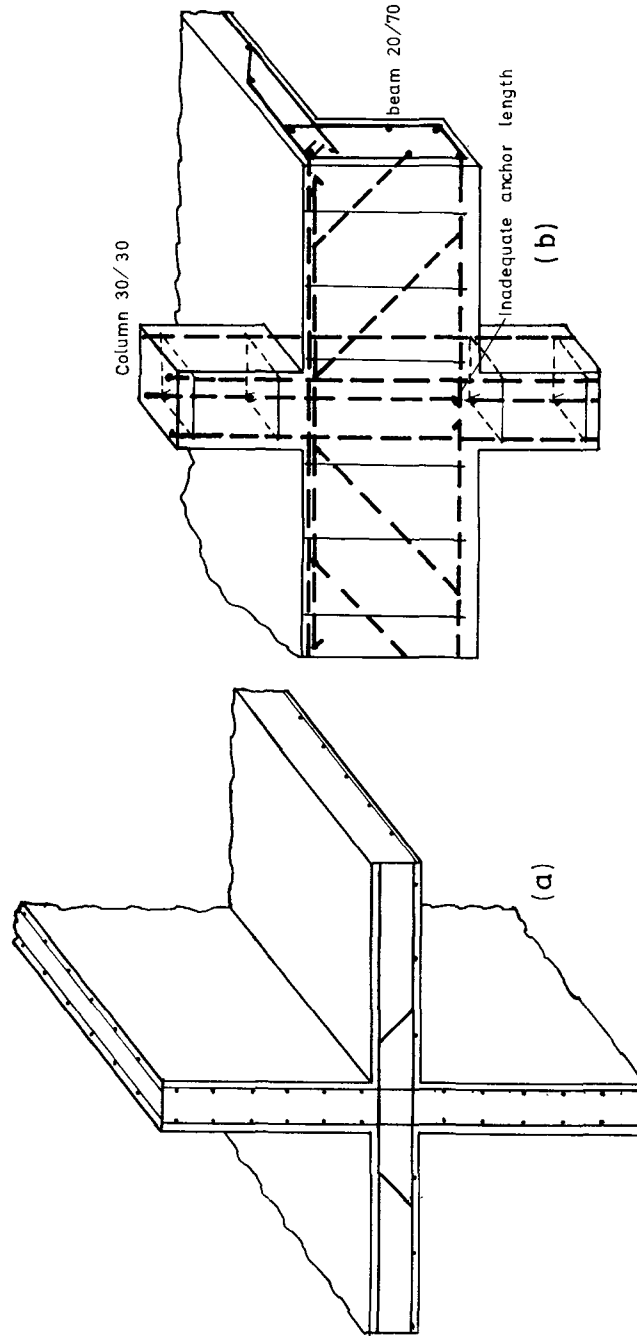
Typical joint between vertical and horizontal elements as usually constructed in the area. (a) Wall-slab joint. The bottom reinforcement is insufficient to resist the positive moment at the support produced by lateral forces. (b) Column-beam joint. The anchor length is inadequate because the bottom bars are not continuous through the joint.
